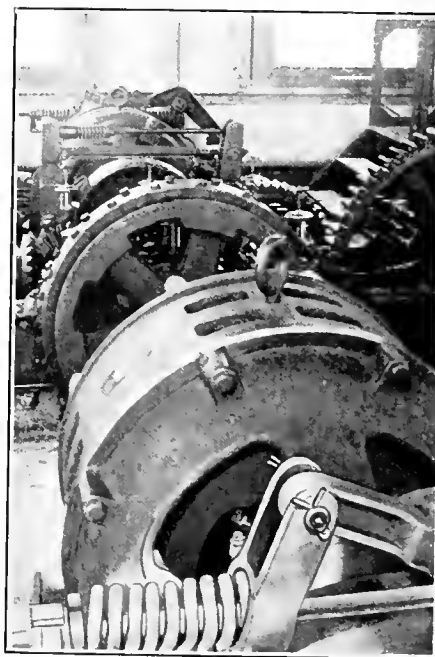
MOTORS AND BRAKE SHAFT OF BRIDGE SHOWN IN FIG. 1
